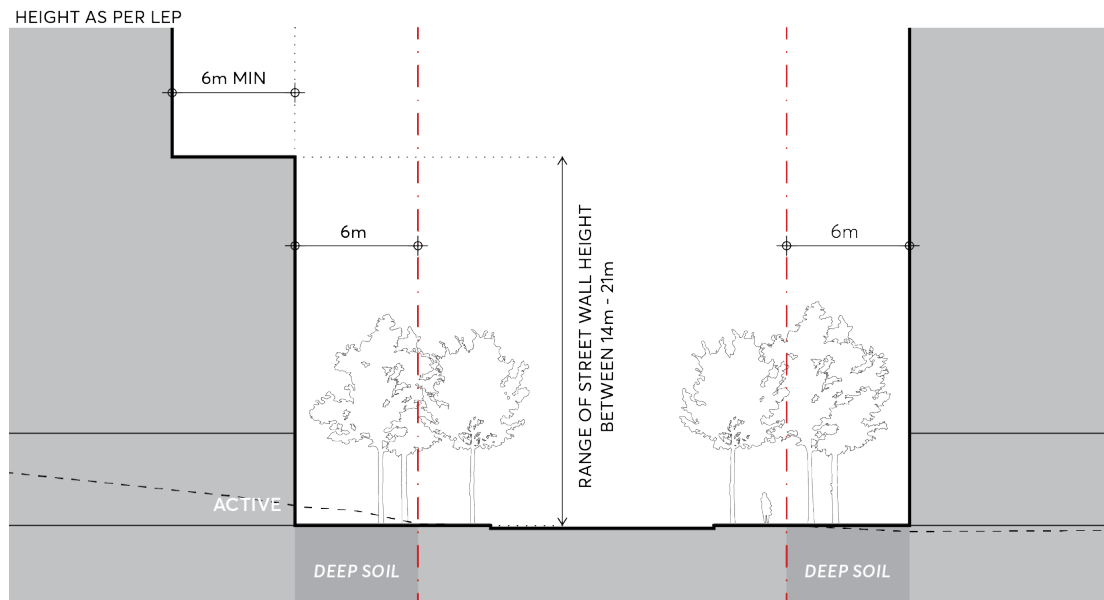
Campbell Street (Section A) Setbacks and Street Wall Height
